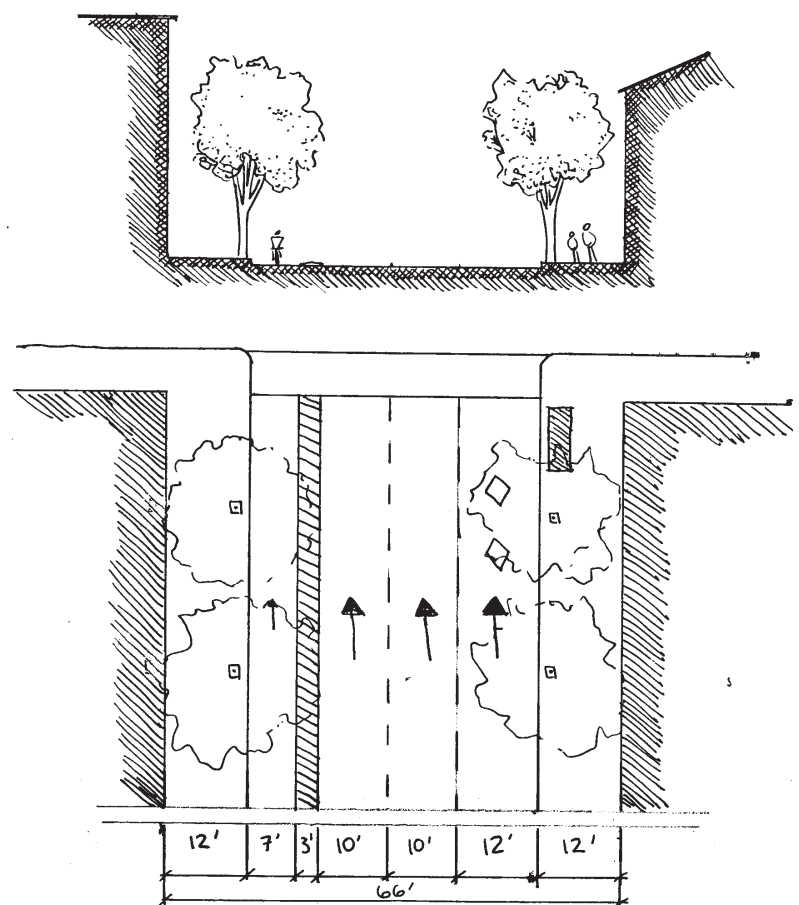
Marion Street -- Conceptual Plan & Cross-Section
